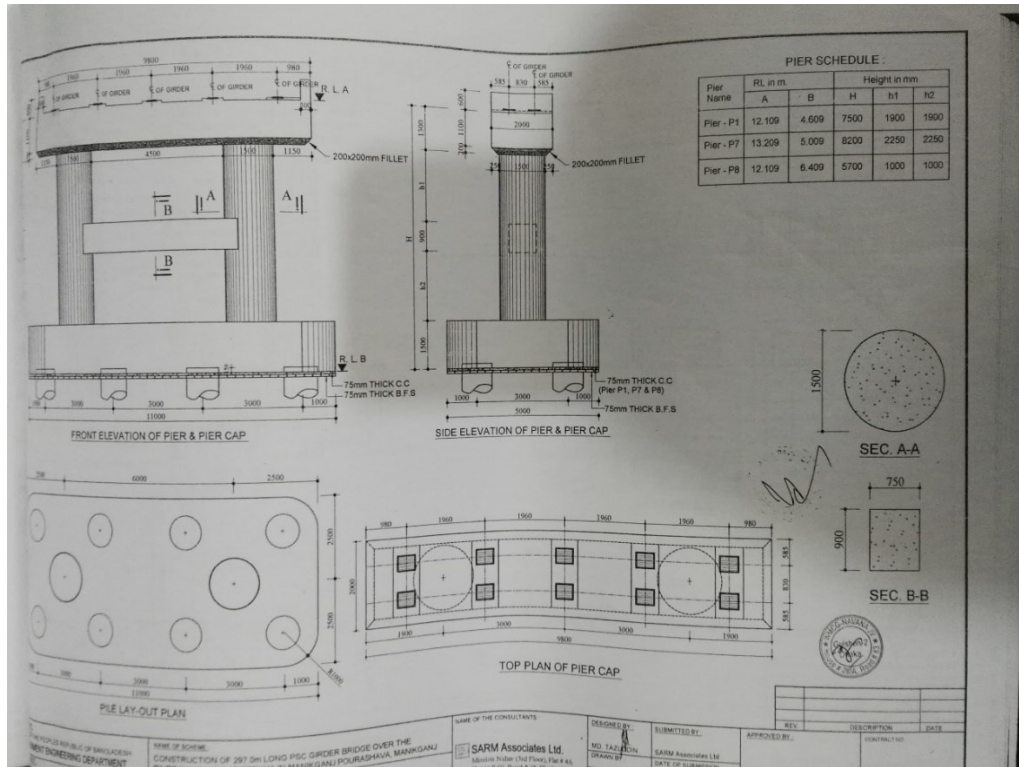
Structural Drawing (Piers 1, 7 and 8)
